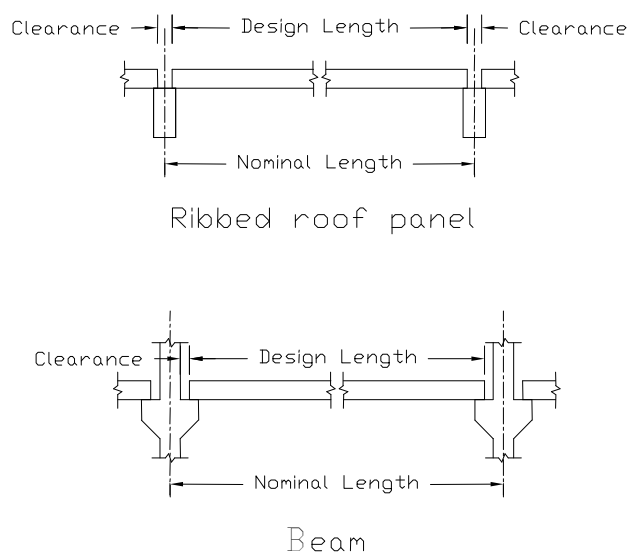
Nominal and design dimensions of precast elements (Murashev et al., 1971)
